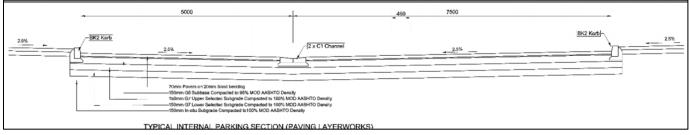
PROPOSED ROAD LAYERWORKS: BRICK PAVING- 540MM TOTAL THICKNESS (SOURCE: WALTERS, 2020)
